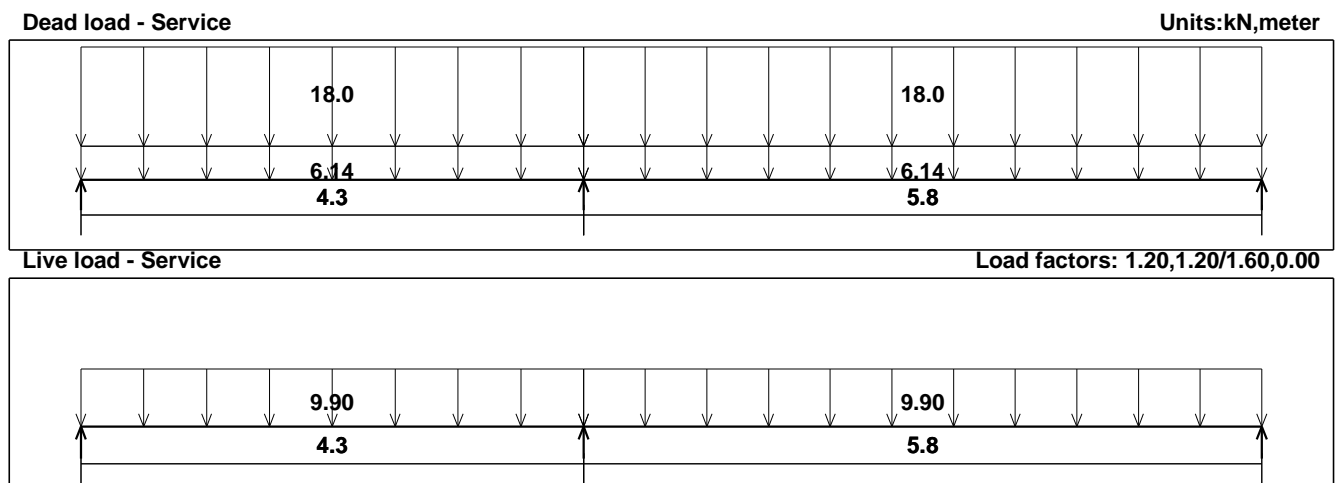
Static System and Loads Distribution of Beam (B 16)
